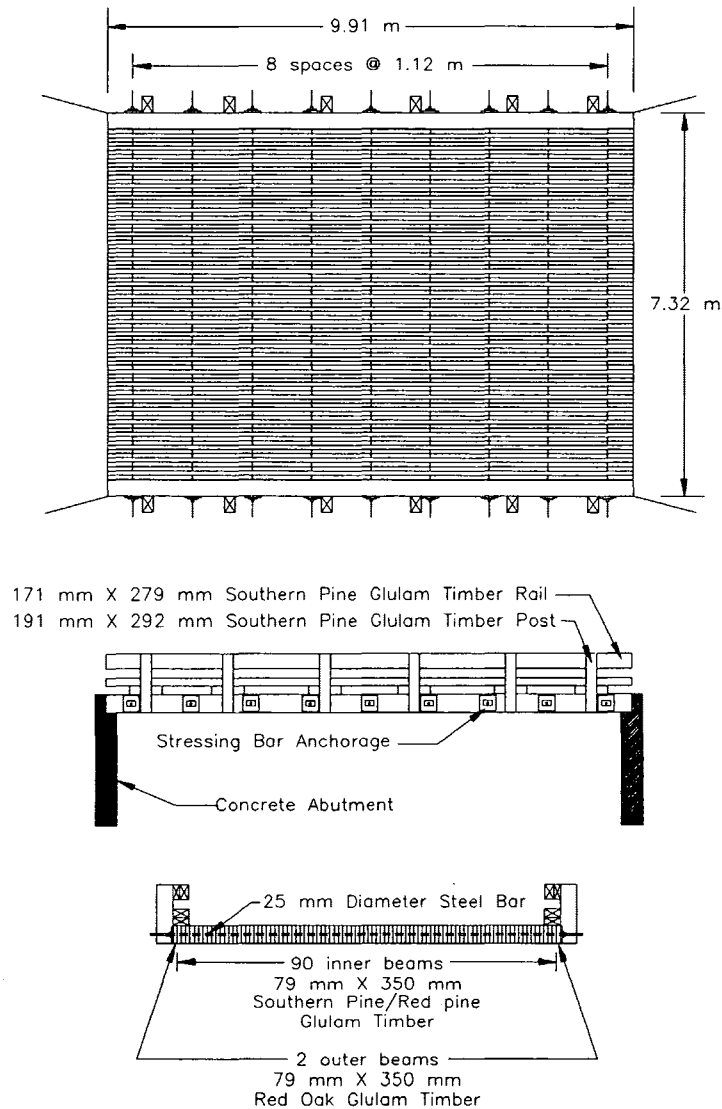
Design configuration of Teal River bridge: *top*, plan view; *middle*, profile view; *bottom*, cross section.
